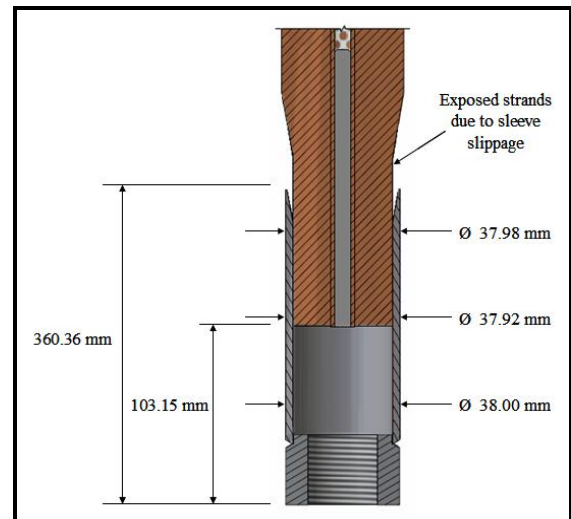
Dimensions of TF-WC2-FS upper grip sleeve before pull test
